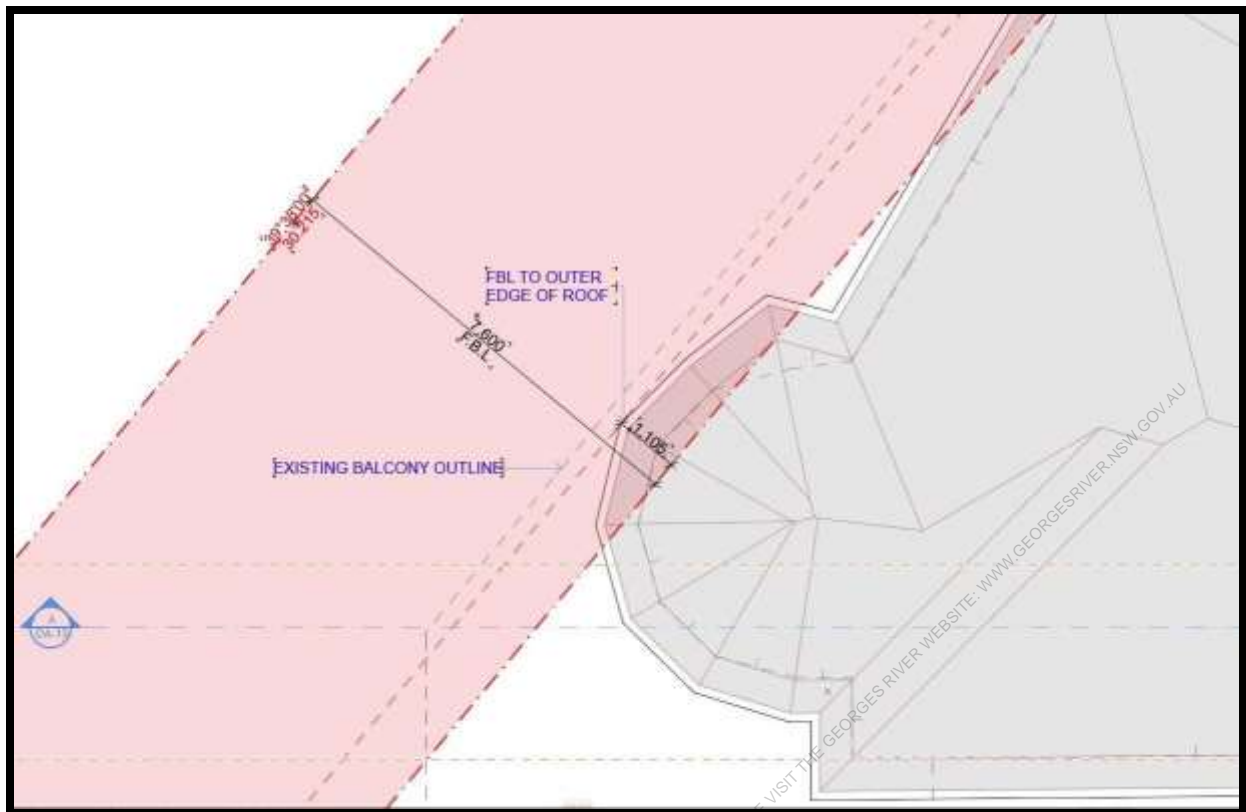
The extent of roof works within foreshore building line demonstrate maximum encroachment of 1105mm.
